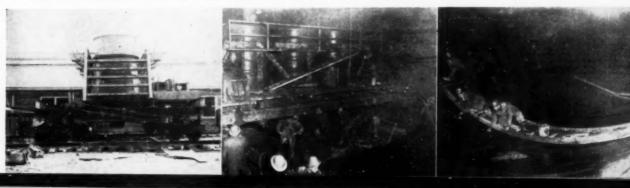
Concrete for invert is dropped through steel-cased holes to tunnel level, where it is received in hopper mounted on wheeled tower. Thence it is fed into three 10-cu yd hoppers mounted on self-propelled steel-frame traveler which transports it to site.
